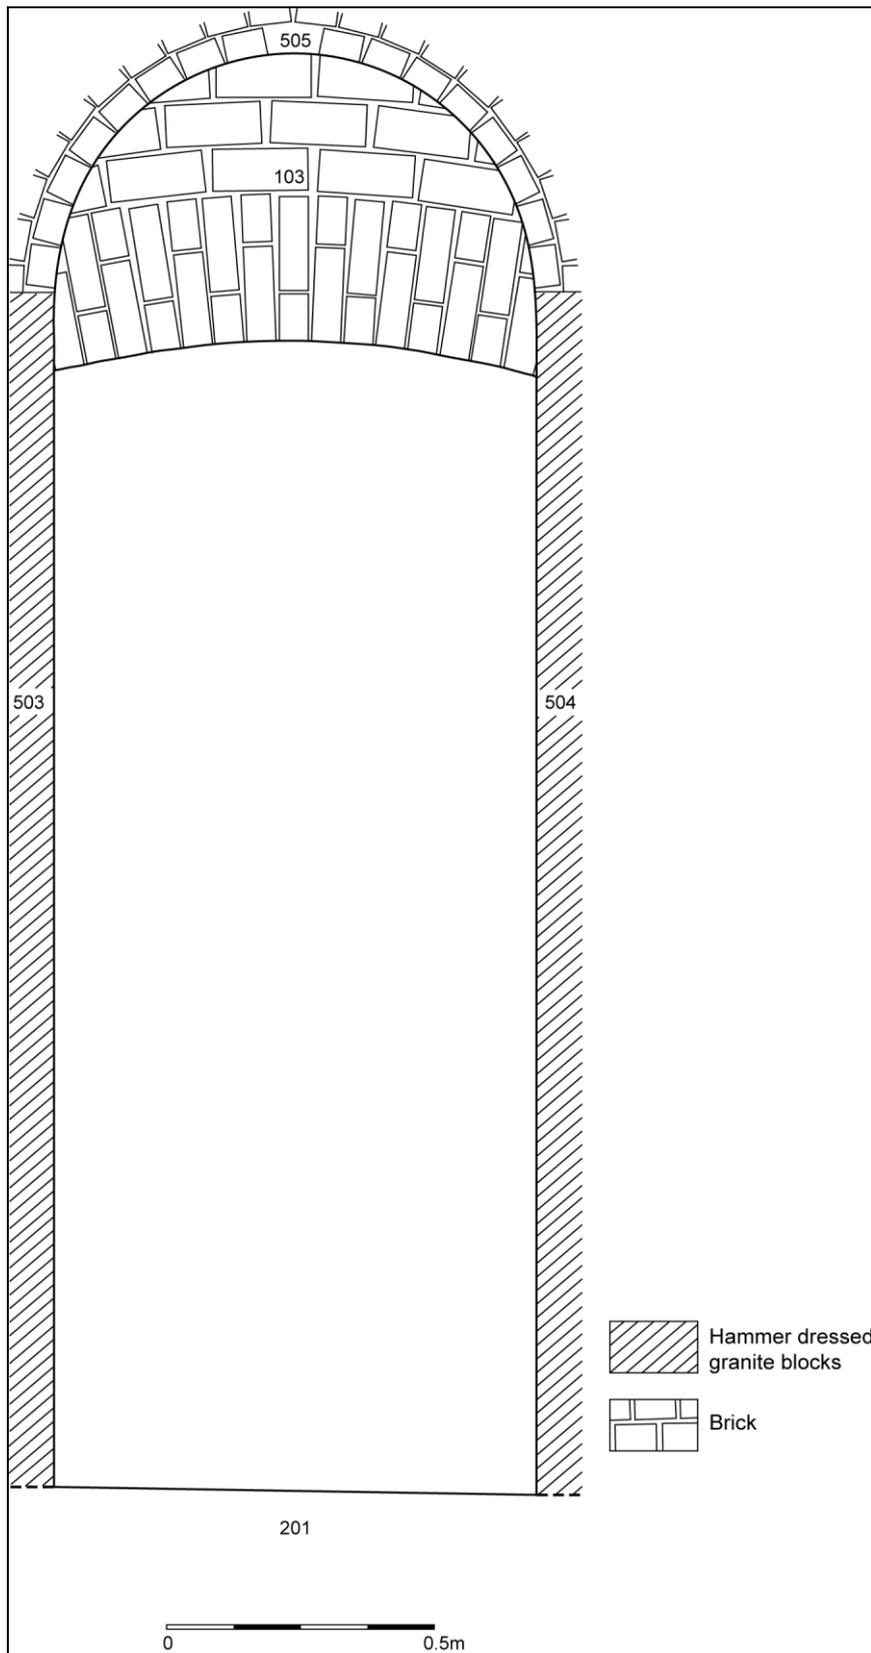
West-facing section at junction of Flash Room Corridor and Flash Room
